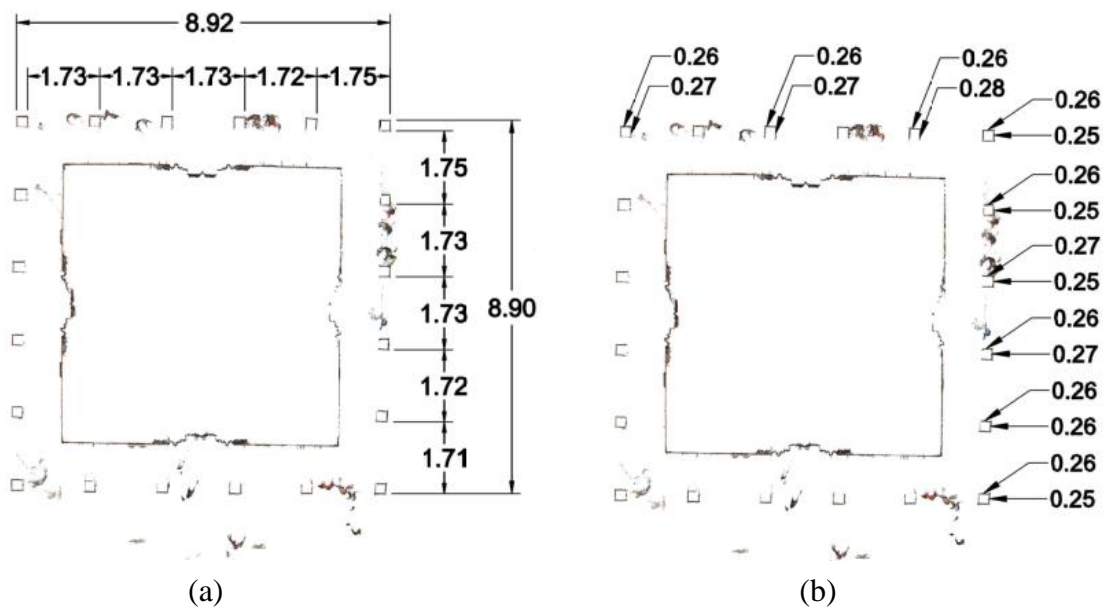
Columns of Nyatapola Temple: (a) columns spacing and (b) columns cross-section dimensions. Note all dimensions are in meters.
